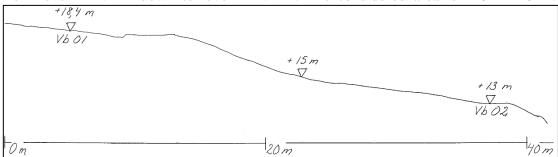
Cross-section 185 from Kvibergsbäcken location.
